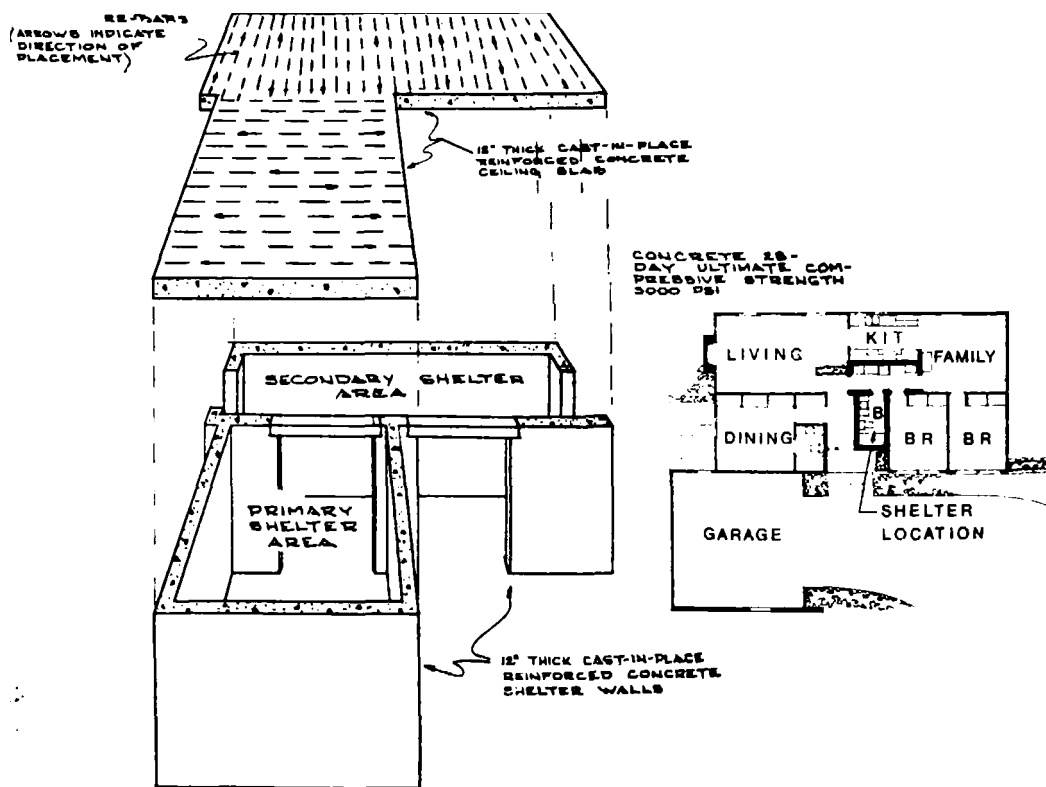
Permanent Ground Floor Shelter. This shelter is built (during the construction of the house by substituting reinforced concrete for conventional materials in several interior walls. (Reprinted
